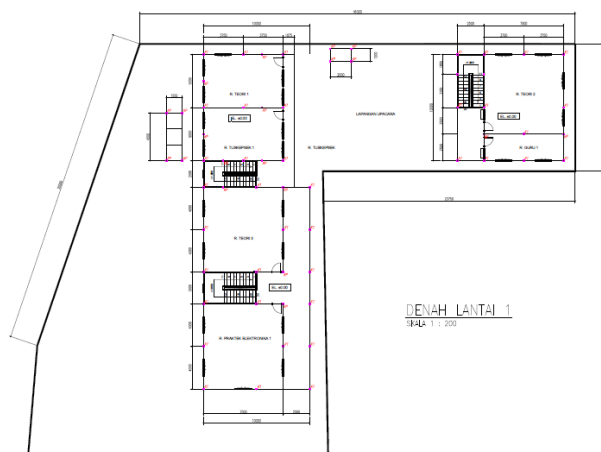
Floor plan Building Vocational School Al- Murqoniyah
